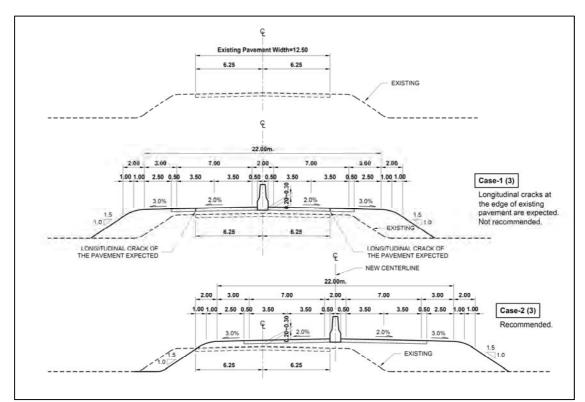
TYPICAL CROSS SECTION PATTERN-2: EXISTING PAVEMENT WIDTH=12.50M.
